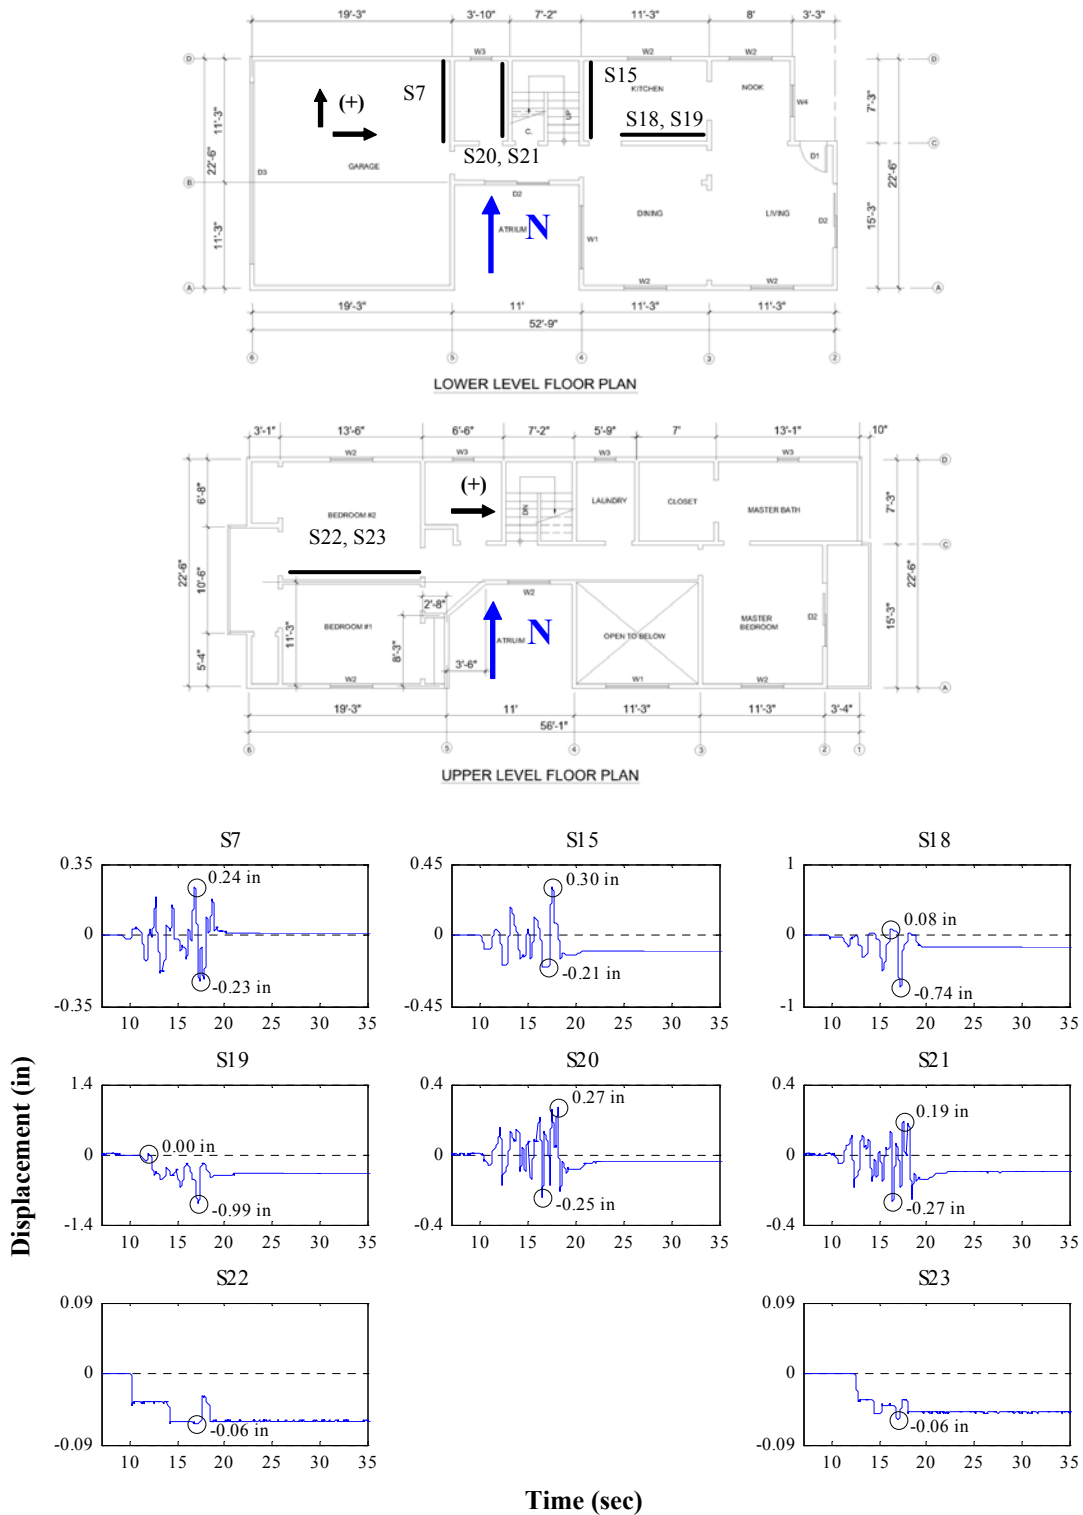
Wall deformations of internal walls for Test NWP1S05
